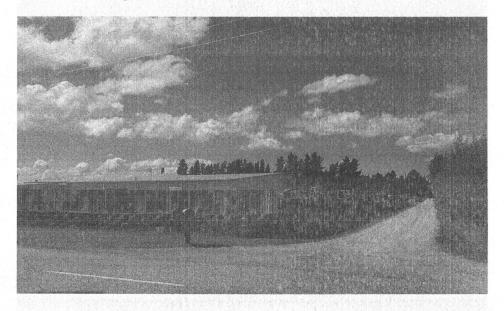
View of wall at entrance to private road with wall inset from boundary along the private road
